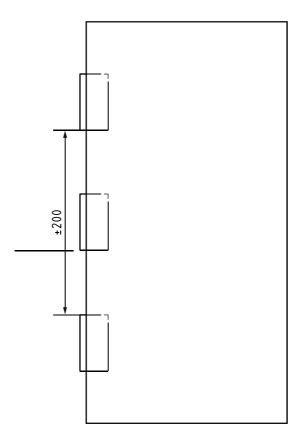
Position of multiple latches/locks/strike plates (with or without connecting rods) - Alternative
